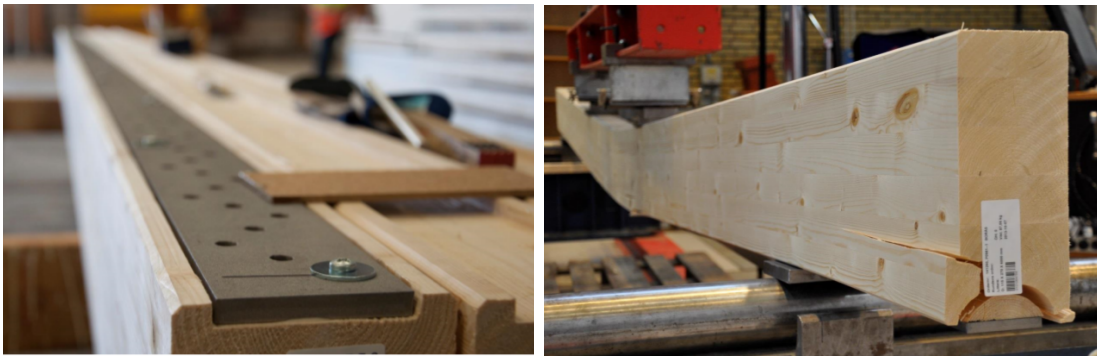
A complex timber-steel connection to obtain a hinged boundary condition. Photo © Åke E:son Lindman
